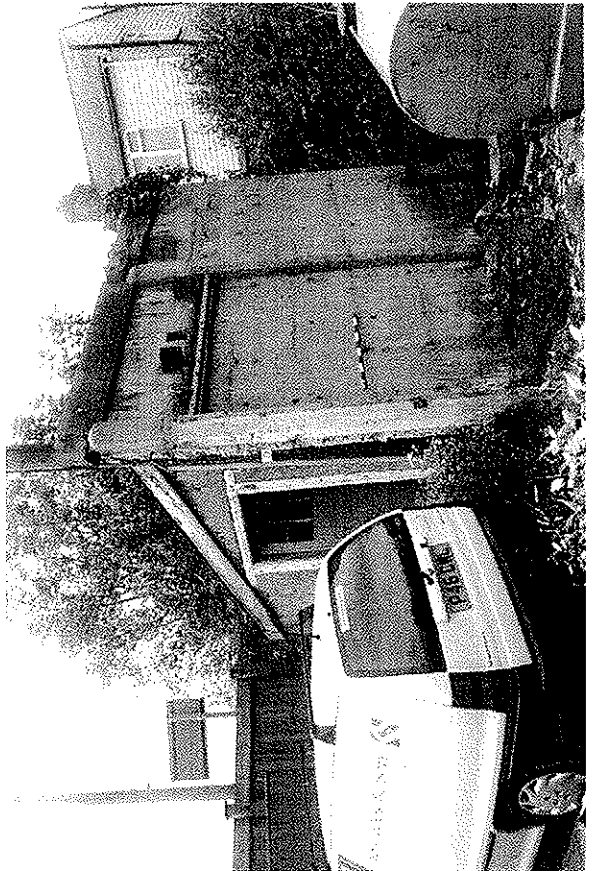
Northern boundary wall (other features 2) showing cast-in-situ concrete construction matching other structures on site.
